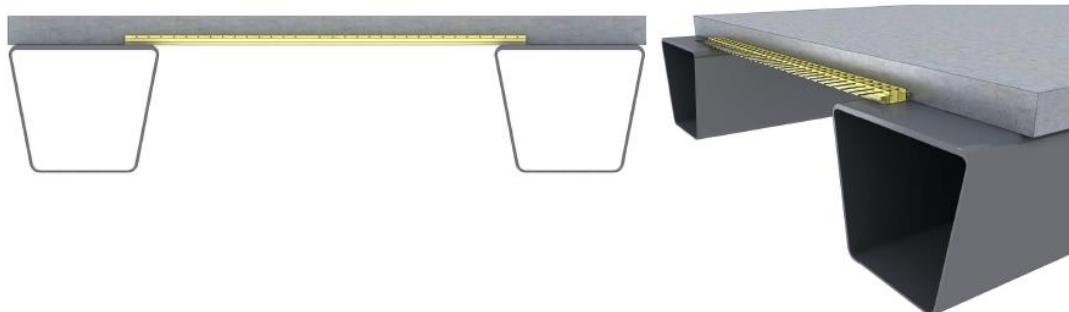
A section view of the deck position on close-shaped beam (Warszawa 2009)
